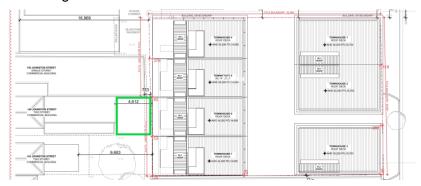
Proposed site plan showing location of SPOS (in green) at No. 140 Johnston Street
